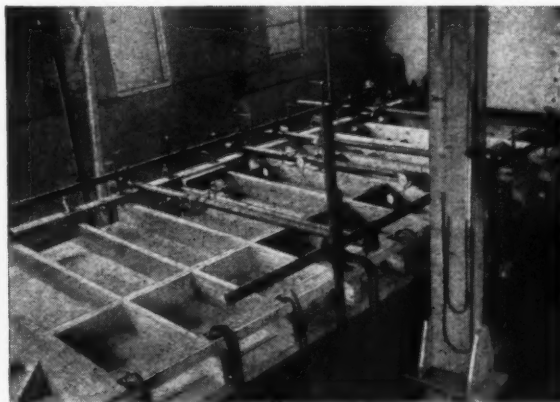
Rig for static loading tests. (Floor section is inverted, with captive airbag beneath for loading.)
